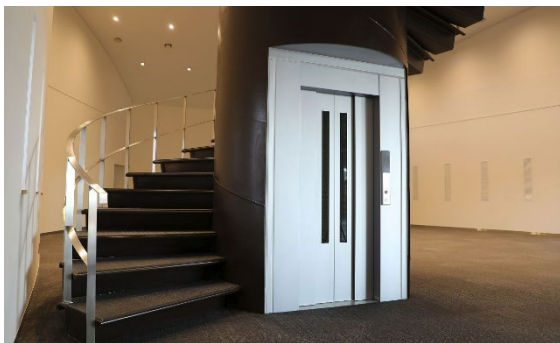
Elevator Shaft used a Steel Tubular Pile
